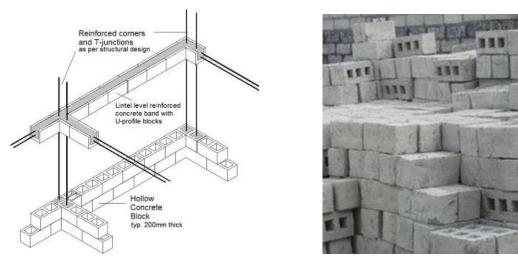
Masonry wall assembly with Hollow Concrete Blocks
